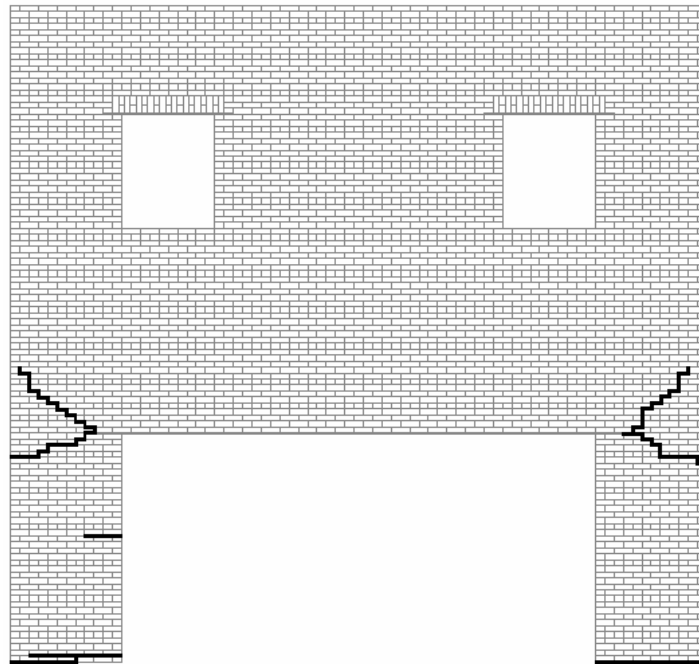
Crack locations in wall 2 after completed seismic testing.
